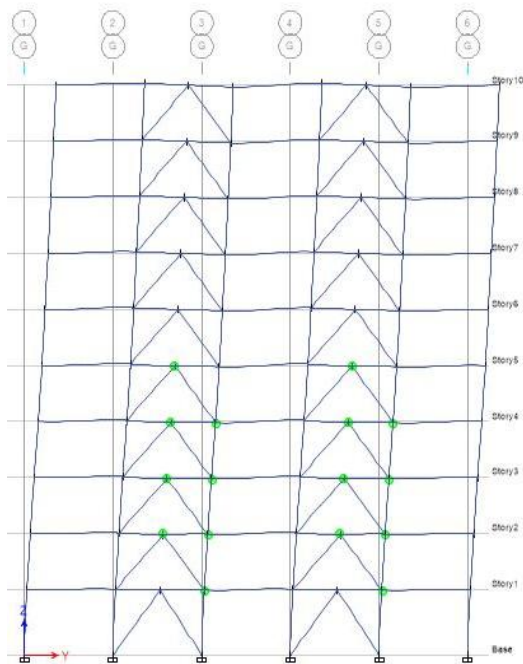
First step plastic hinges forming in the y-direction for R-CIV 10-story building.
